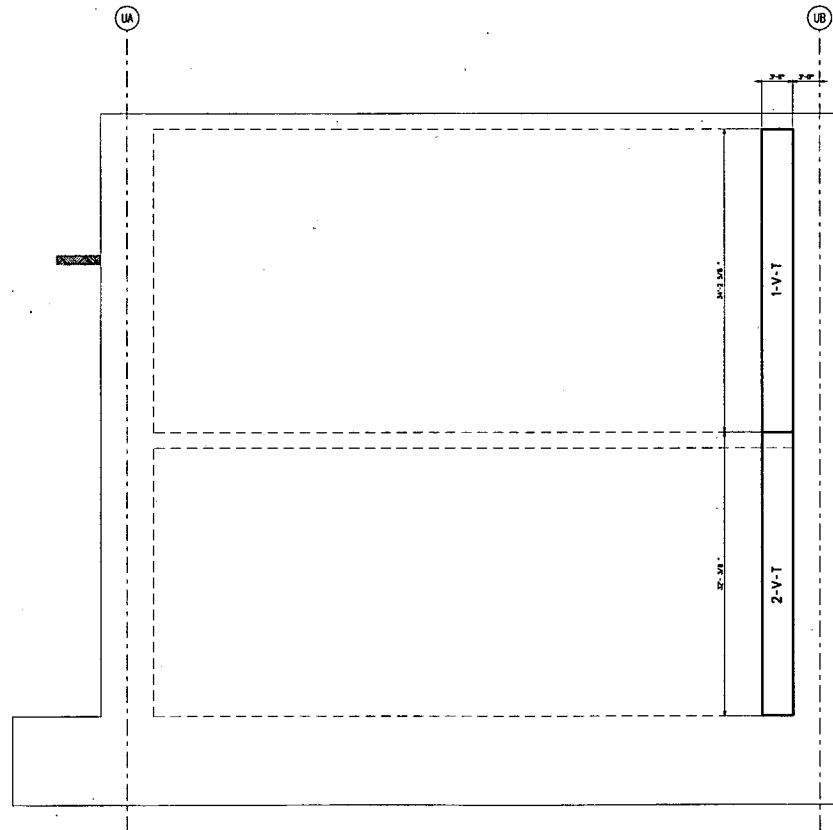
H.6-71: PUMPHOUSE WEST WALL LOOKING EAST
